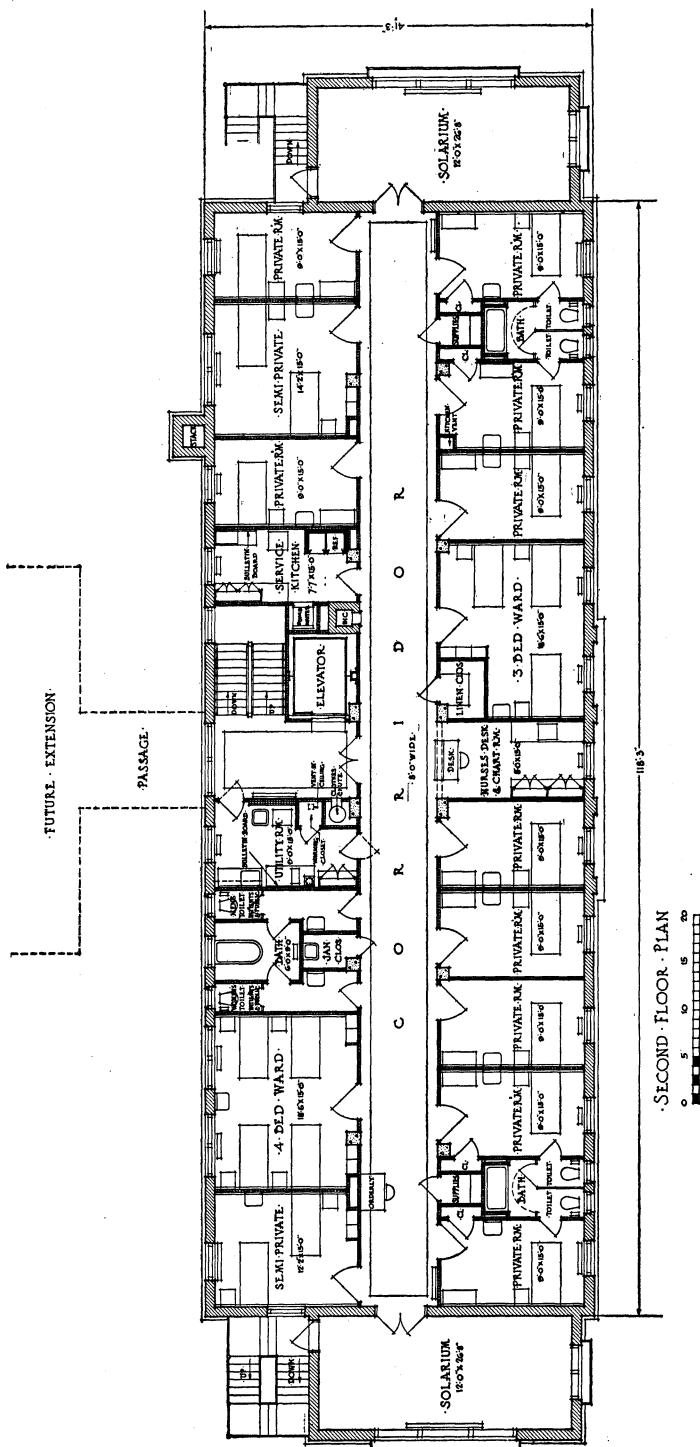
This floor plan provides for 21 beds and would not be used for the 25-bed hospital.
